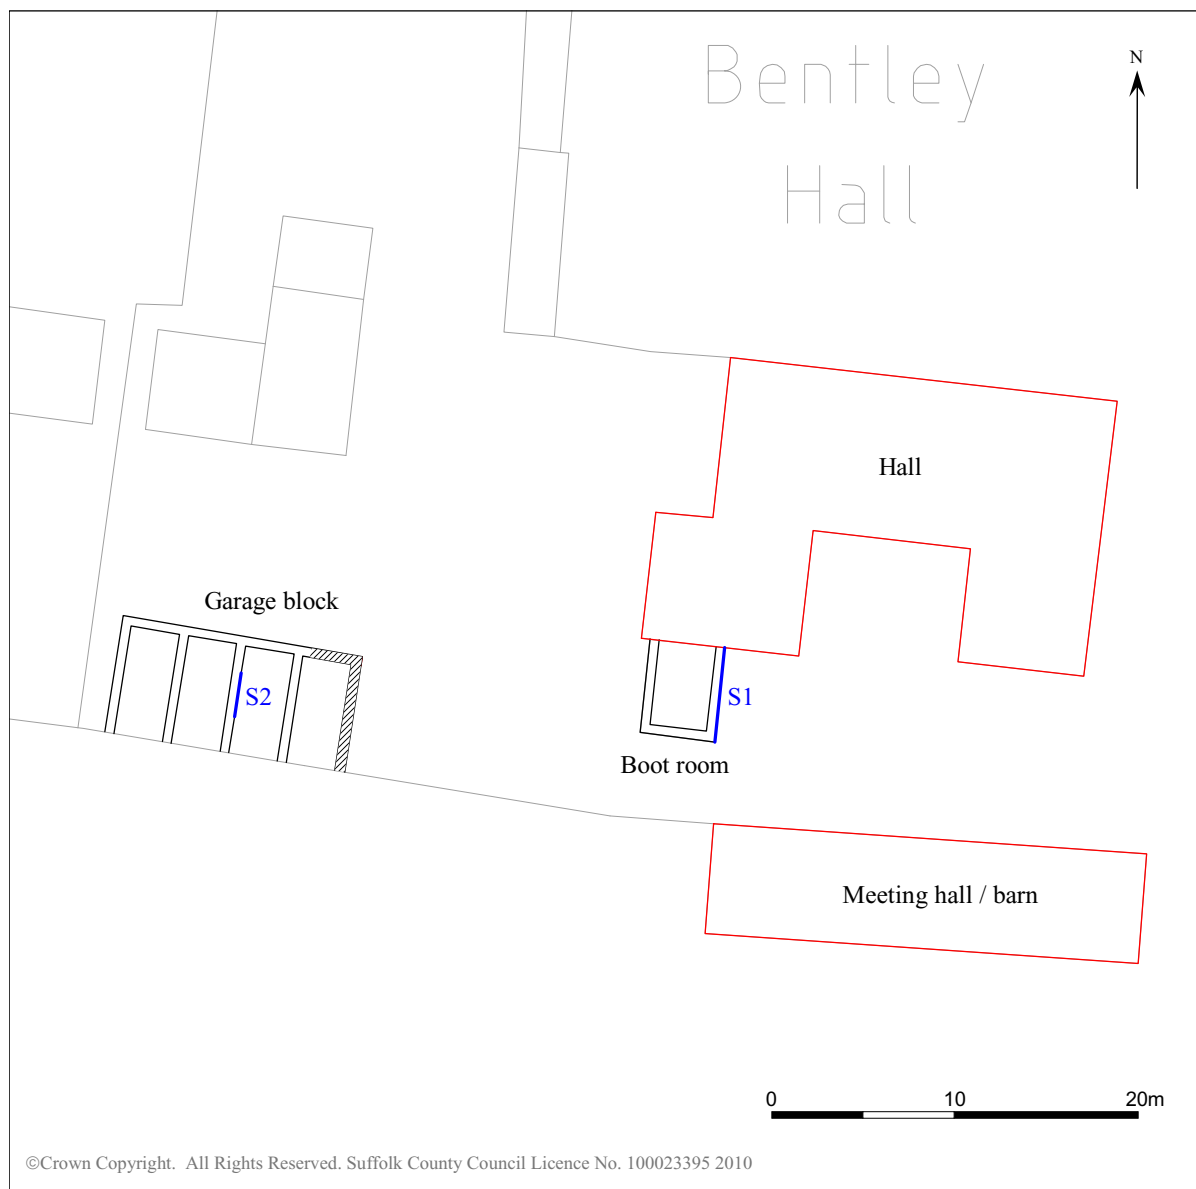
Plan locating the monitored trenches (black) and Sections S1 and S2 (hatched area = trench not observed)
